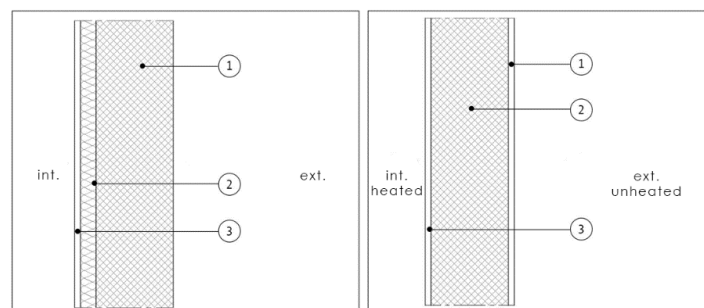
On the left: external load-bearing wall detail (ante operam); on the right: staircase load-bearing wall detail (ante operam)
